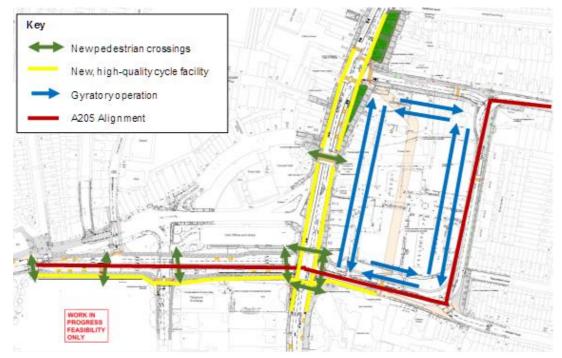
, Do-minimum Option B: Gyratory & highway alignment retained with revised pedestrian crossings, including a new crossing at Catford Bridge station, new public space & enhanced streetscape along A205.
